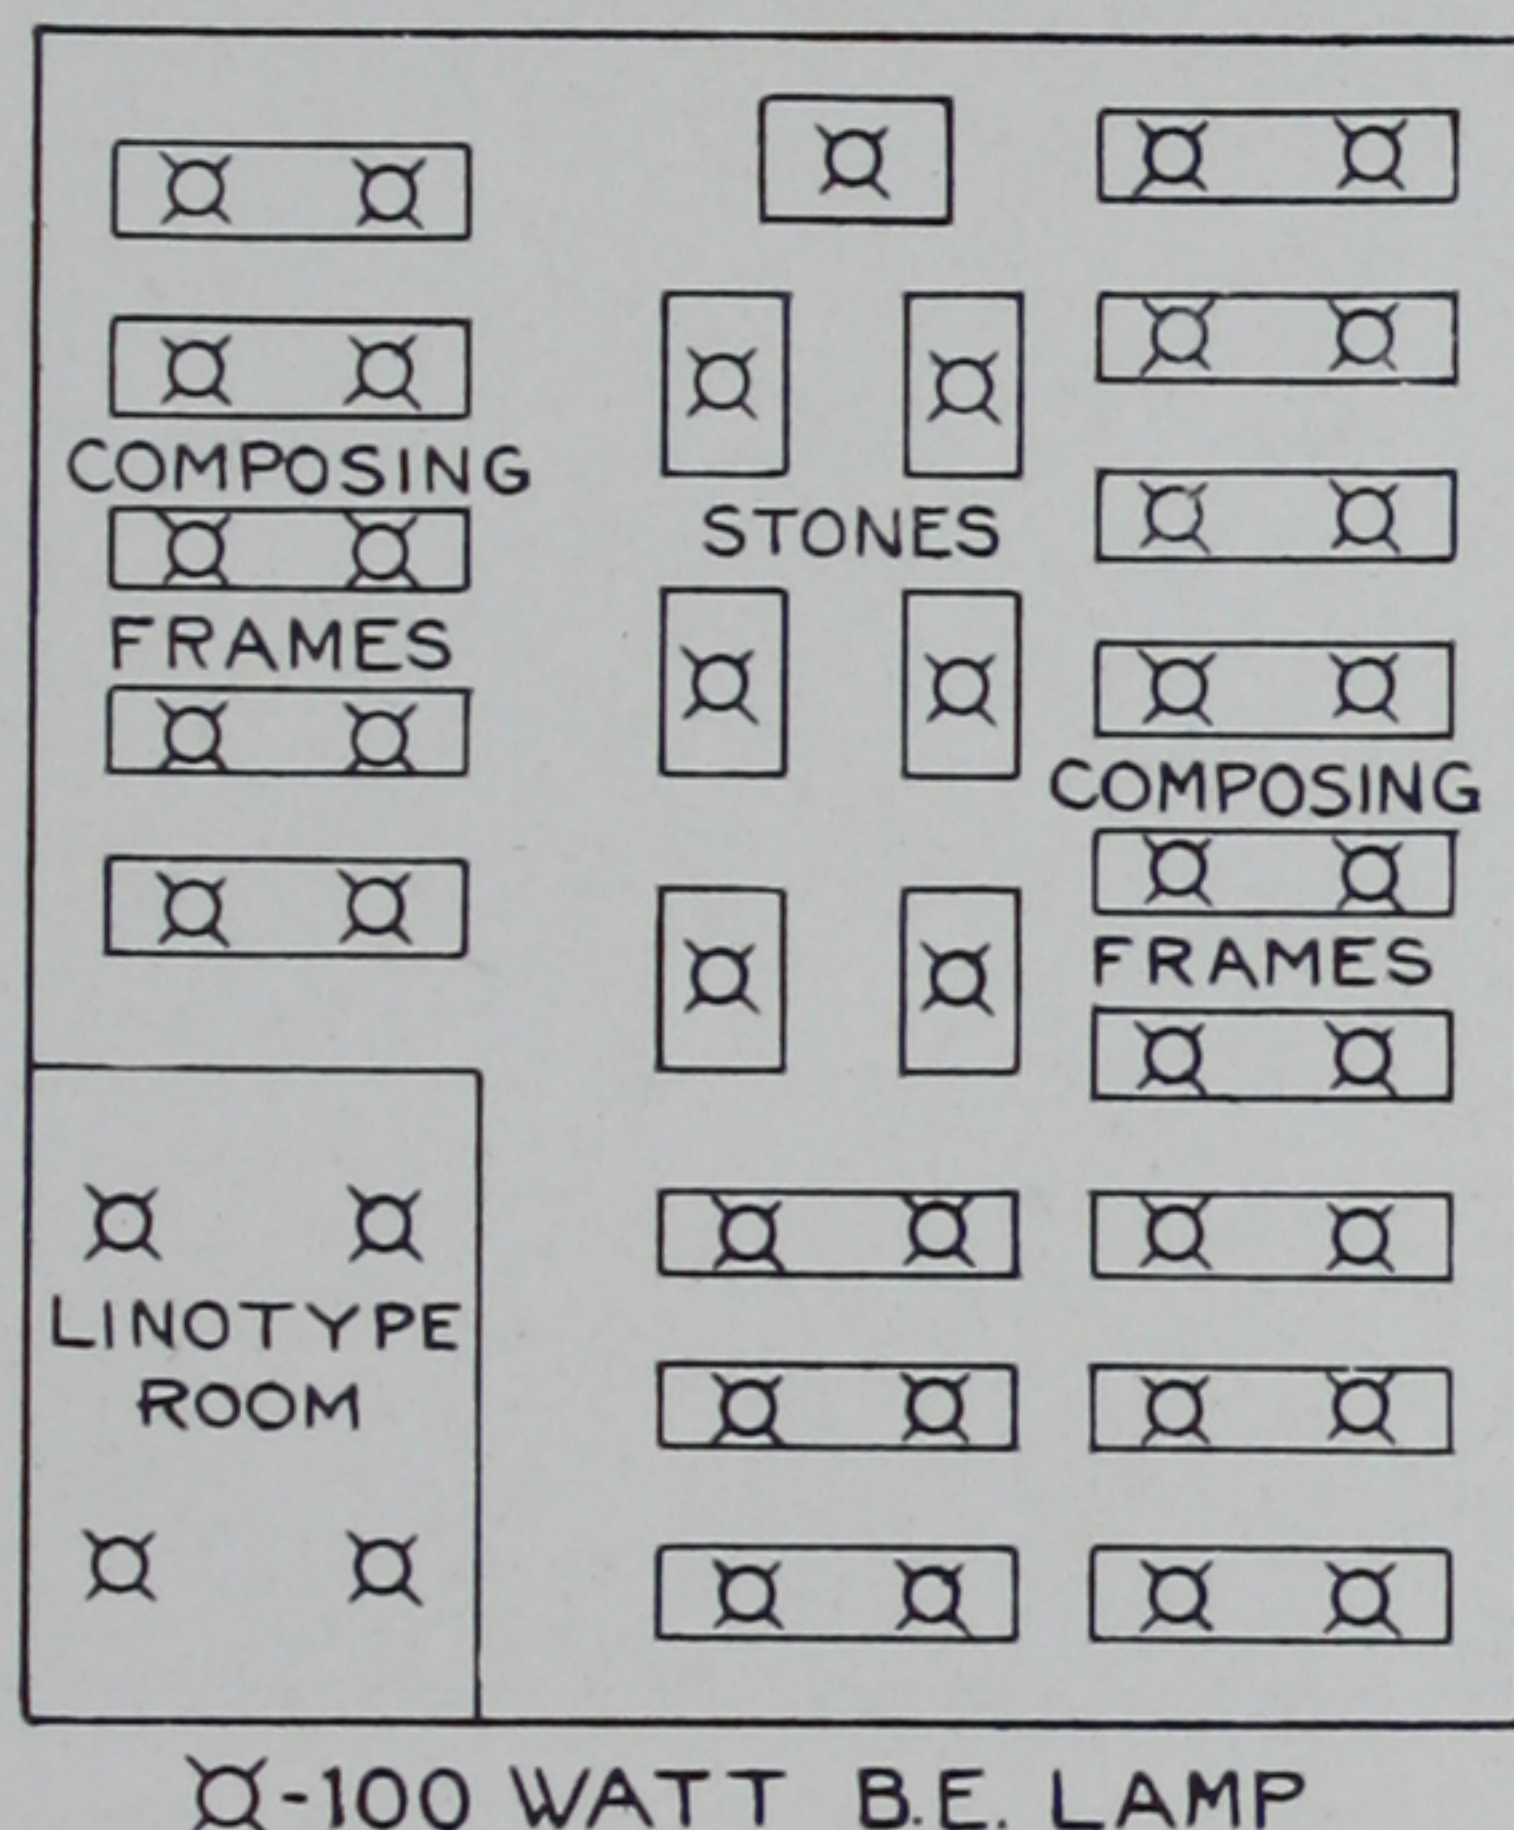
Plan of a Typical Composing Room with a Recommended Lighting Layout
